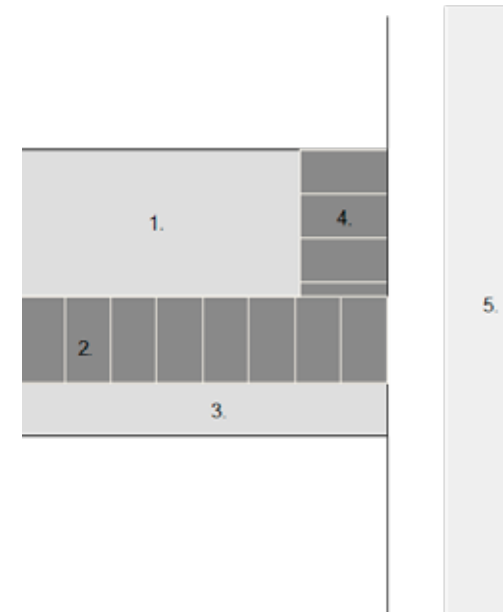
Plan and section of the proposed development showing commercial units opening on to the road and apartments above these and to the interior of the site.
